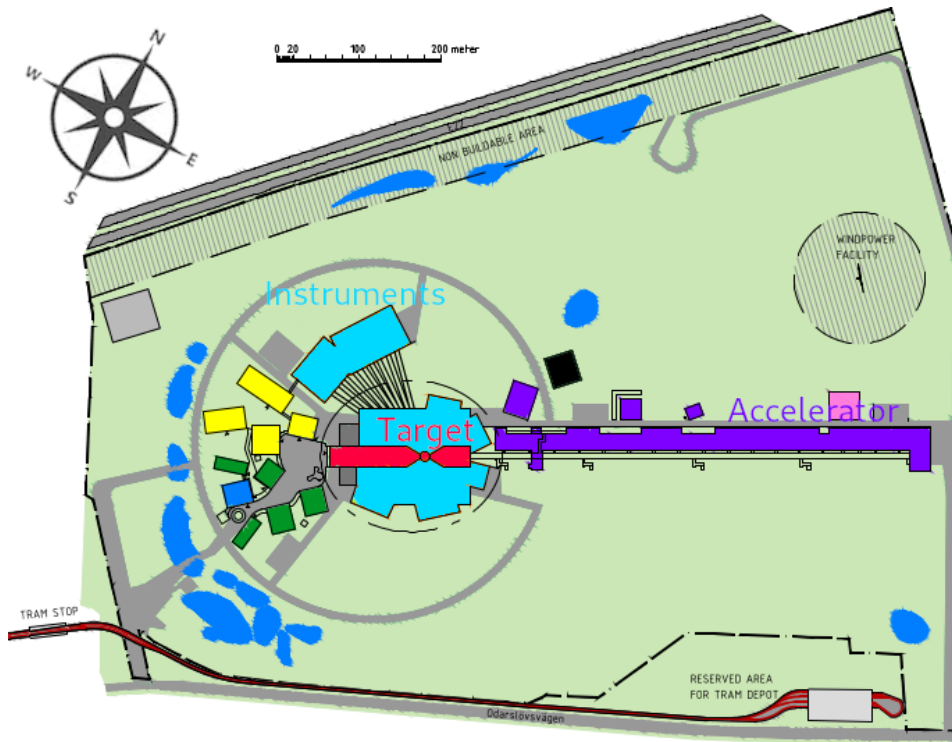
Top view of the preliminary layout for the ESS facility.
